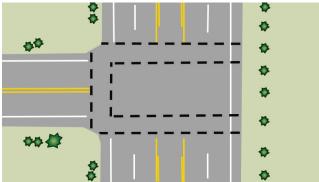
Unmarked crosswalk locations where shoulders connect
